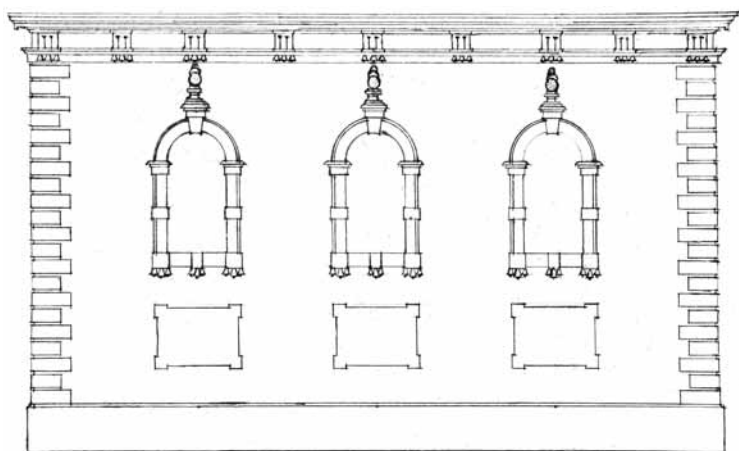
Simon Pitz (attributed to), design for a building, elevation, AKJK, photo: K. Blaschke
